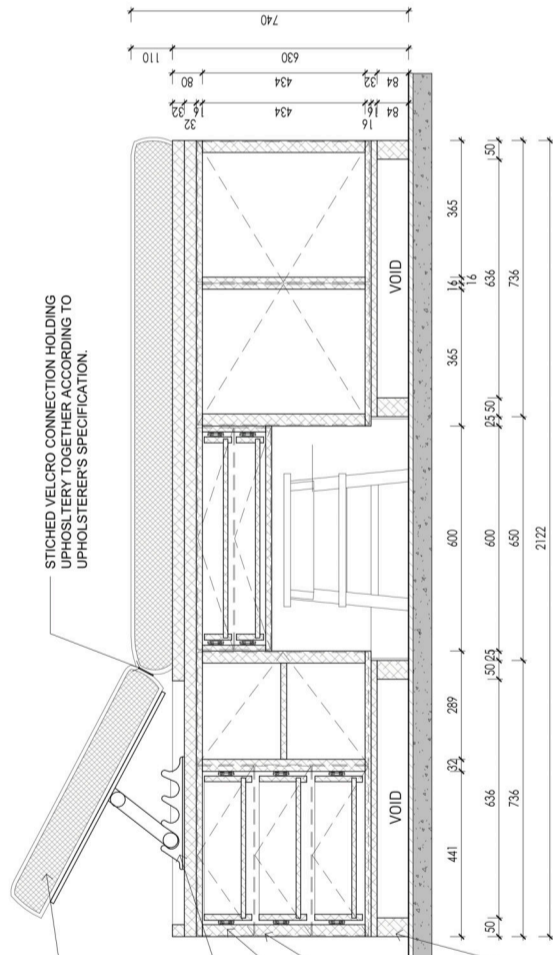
| 1:10 PLAN OF CONSULTATION BED AND WALL-MOUNTED BACKREST
